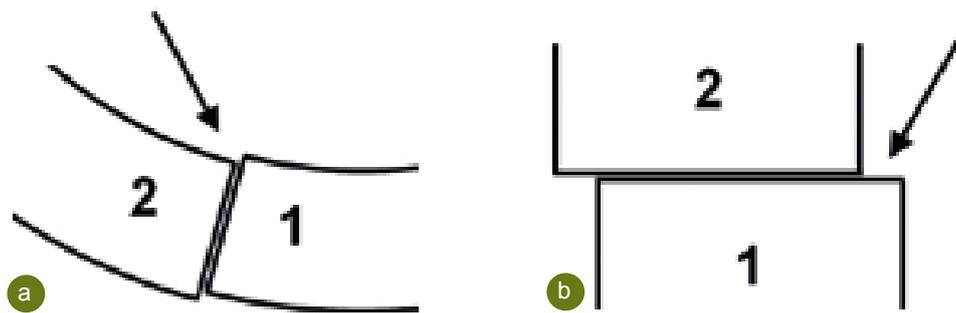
Placement tolerances of the wedge blocks:
